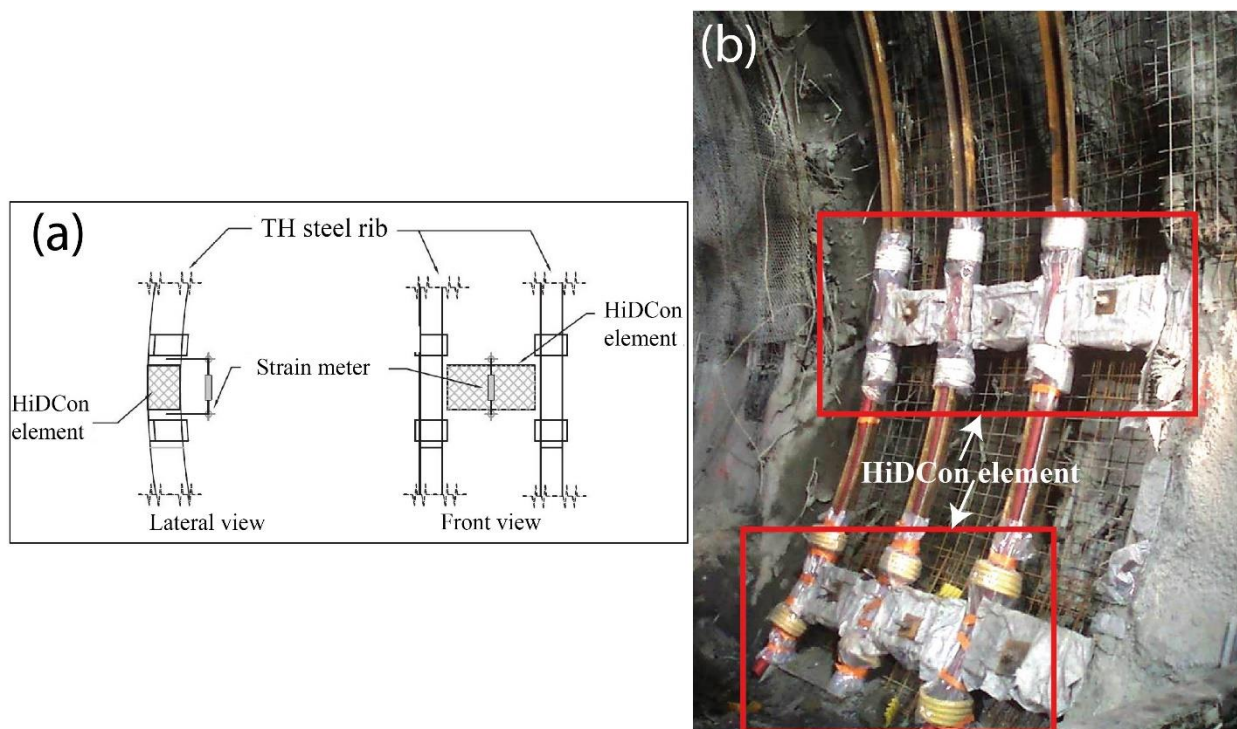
(a) HiDCon elements installed in lining with special monitoring section, and (b) HiDCon elements during installation in between TH steel ribs (before placement of shotcrete) (modified after Barla et al., 2011).
